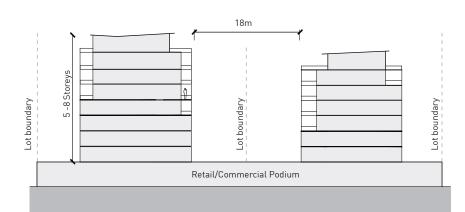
A.1-3: Minimum building separation controls for residential buildings of 5-8 storeys (over commercial podium).
